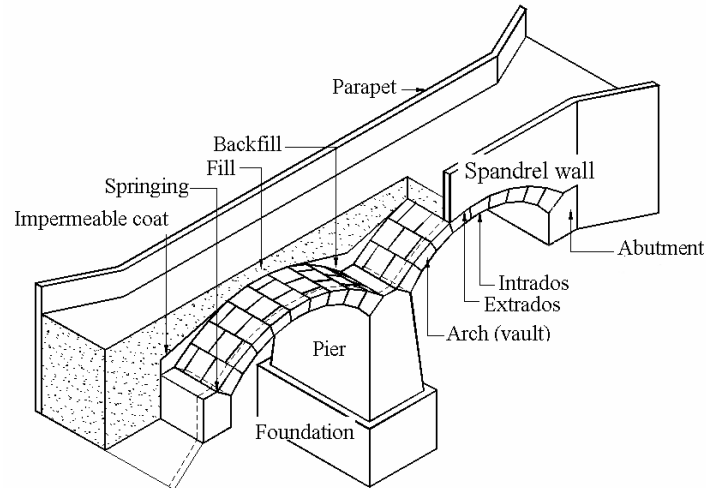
Axonometric section plane of a masonry bridge (Brencich [6]).
